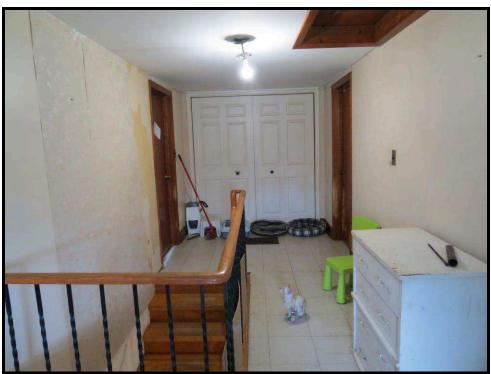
Hallway (Photo taken on June 13, 2018; Facing West)
